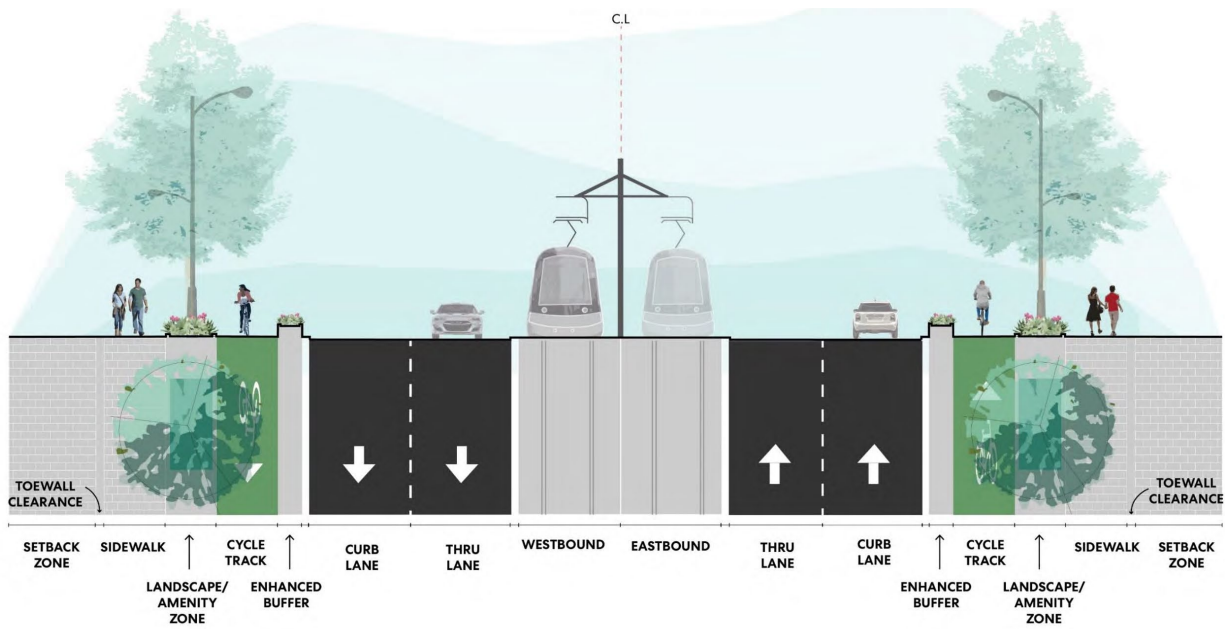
Typical Cross-Section of the SERT at Eglinton Avenue and Kingston Road
